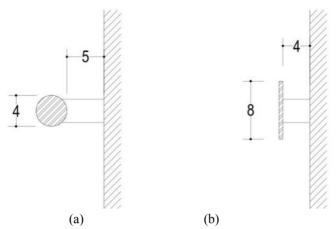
Handrail on elevator Type A and B; (b) Handrail on elevator Type C
